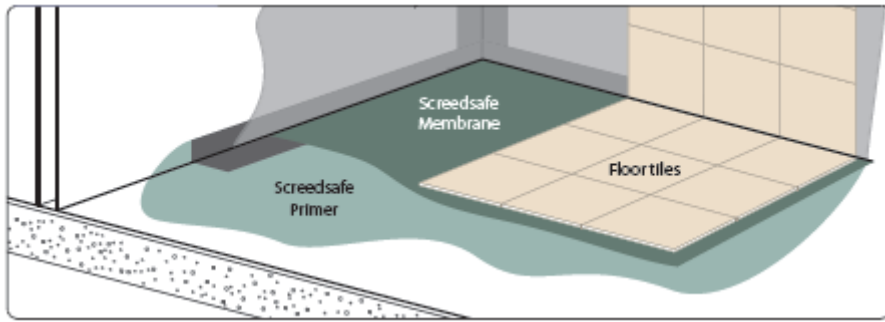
Floor moisture protection system (ccl-wetrooms 2015)
